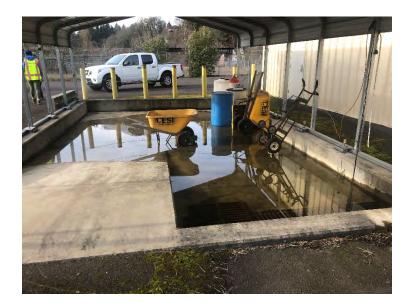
View of the ponding at the site outdoor storage area. Pump was reset.
